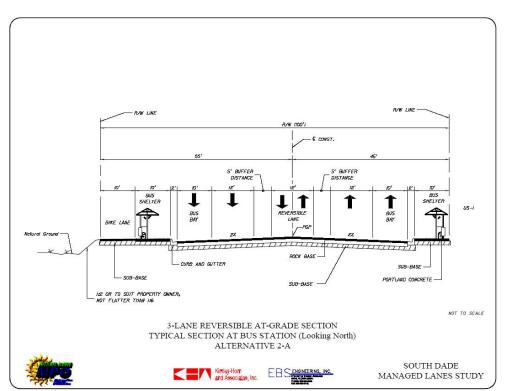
Typical Cross Section of the Three-Lane Alternative at a Station
